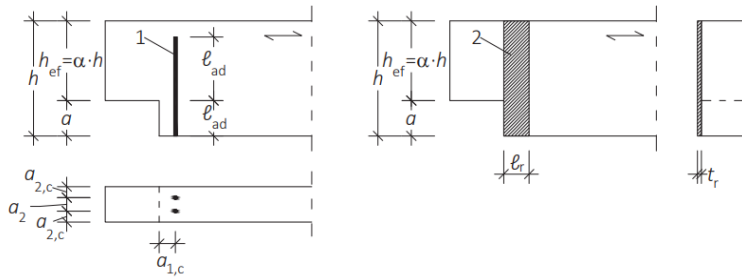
Reinforcement of notched beams with geometric details, 1: Reinforcement with fully threaded screw/ glued-in rod, 2: Reinforcement with glued-on plates [46].
